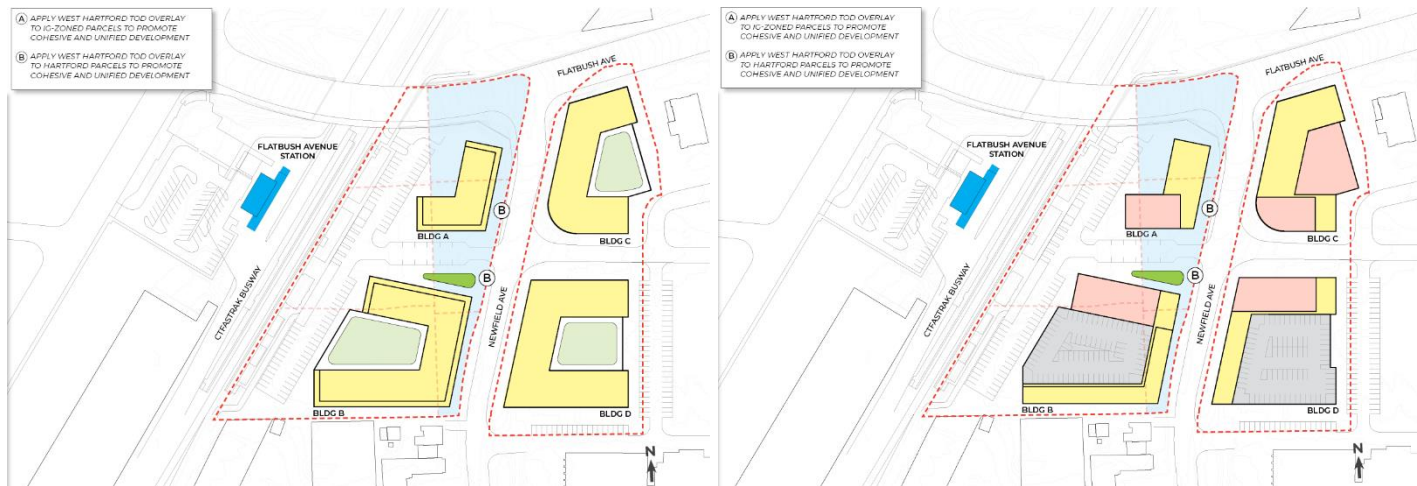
Flatbush Avenue TOD Test-Fit Ground Floor and Aerial Plans
